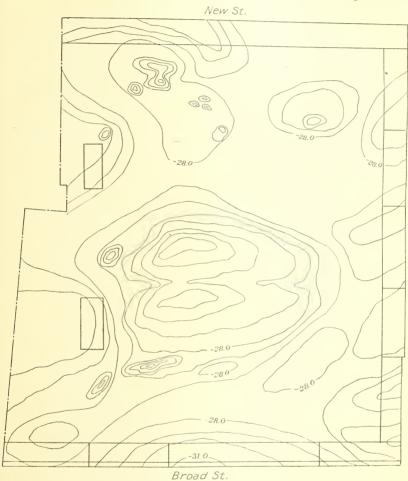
Rock surface beneath new Stock Exchange building, between New and Broad streets.
